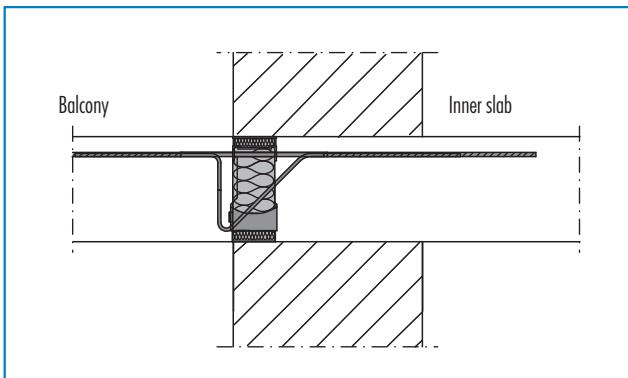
Single-leaf brickwork with a balcony at inner slab level
